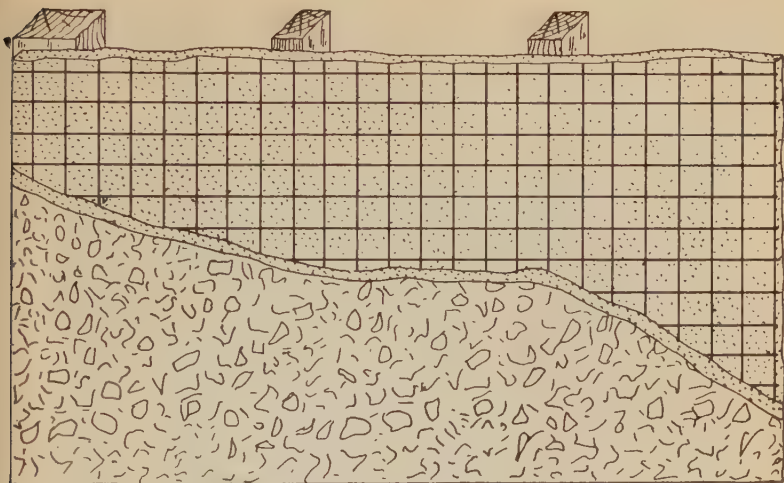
,126.—Stucco applied to new frame building. 9, over wire fabric.
